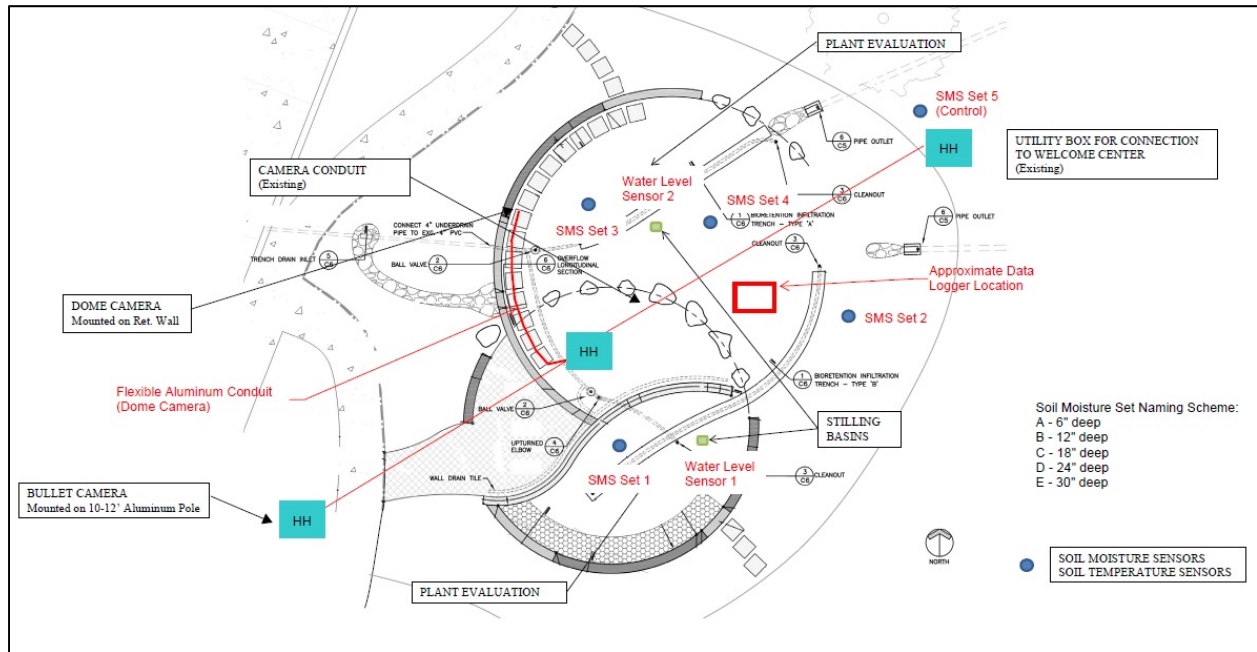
A. Site plan for UNO bioretention system monitoring equipment.
